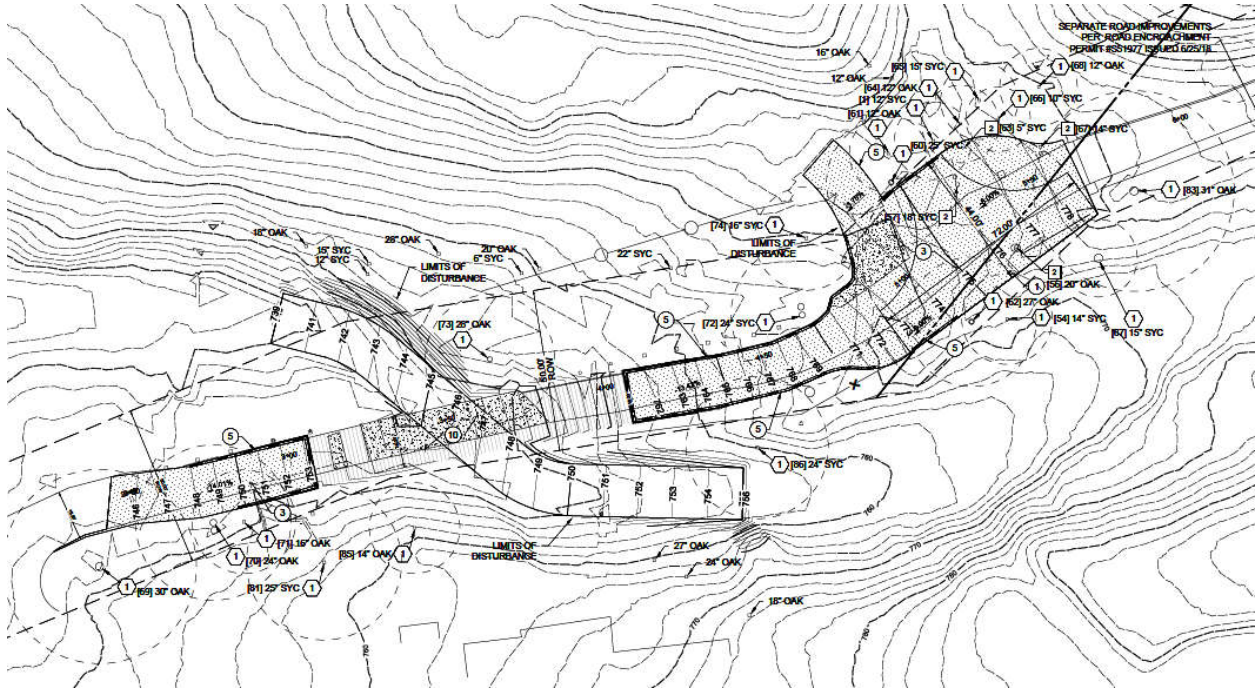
Plan section C-1.2 shows native trees and their Critical Root Zones adjacent or within roadway, turnout, and bridge development. East side inventory table is on page 5, west side is on page 7.
